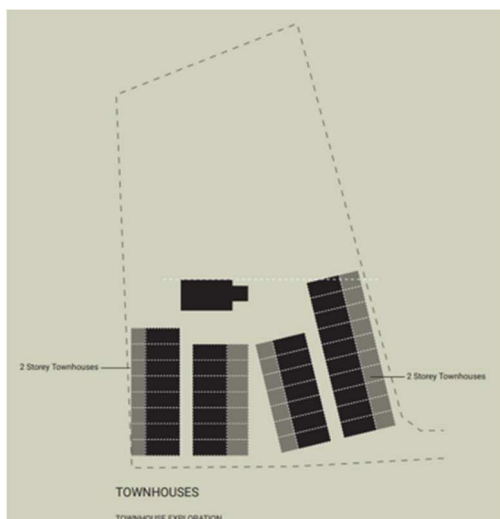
'Townhouse exploration' option for 32 townhouses, including higher density of dwellings to Riverview Terrace and no high-end townhouses. Source: Plus Architecture, 2024.
